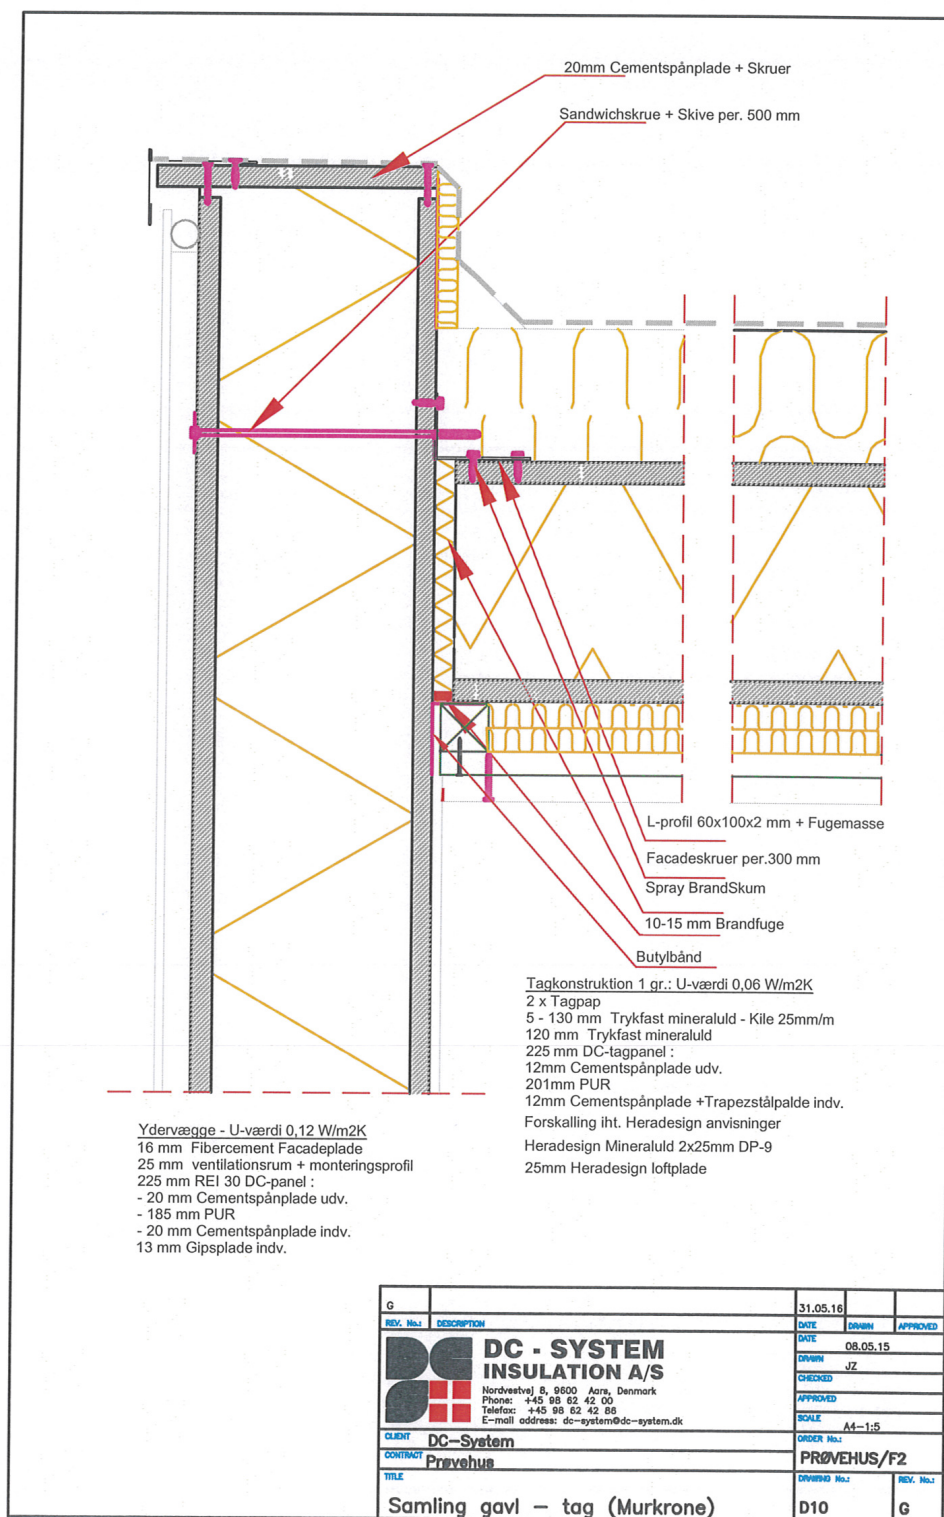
Detail: Wall-roof (gable).[DC-System, Test House (2015)]
